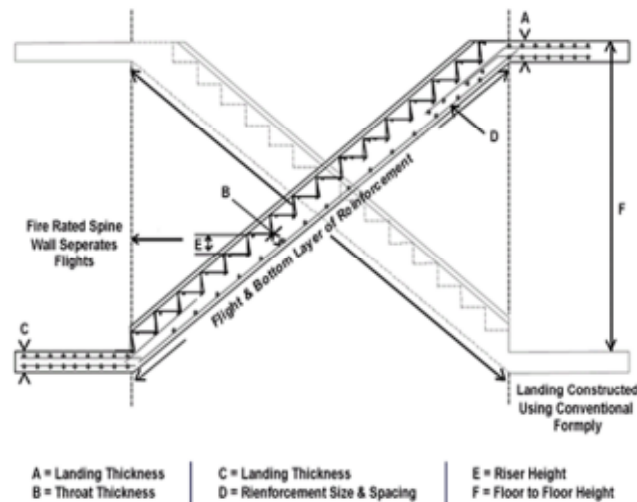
Elevation of Scissor Staircase Design (stairform.co.au)
